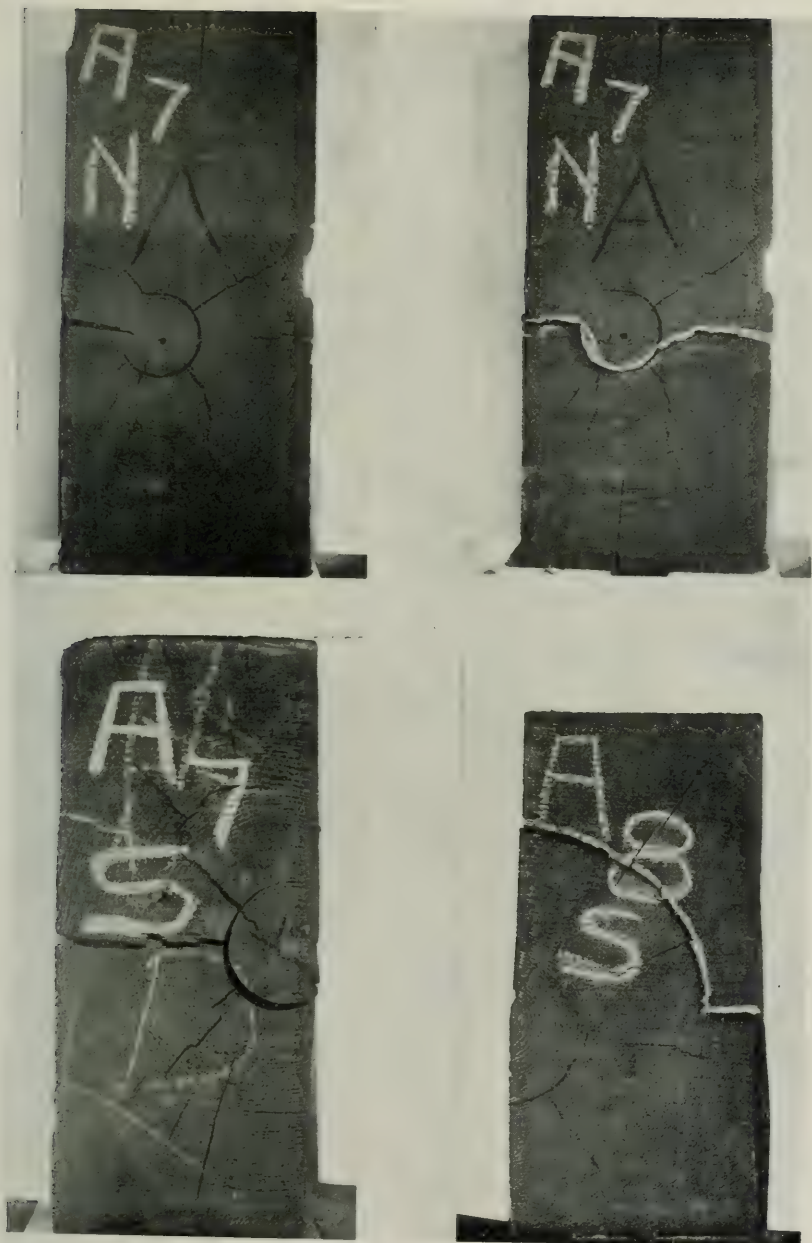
VIEWS OF ENDS OF BEAMS BEFORE AND AFTER FAILURE.
